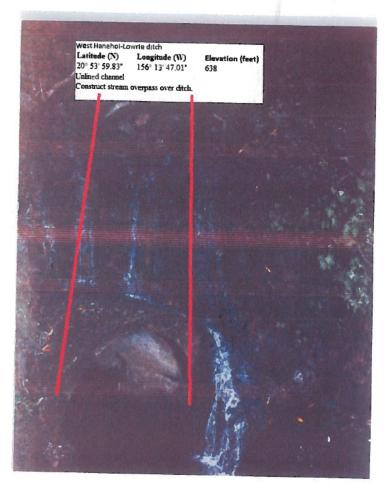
(above): Hanehoi West #2 at Lowrie Ditch (L-7b)
